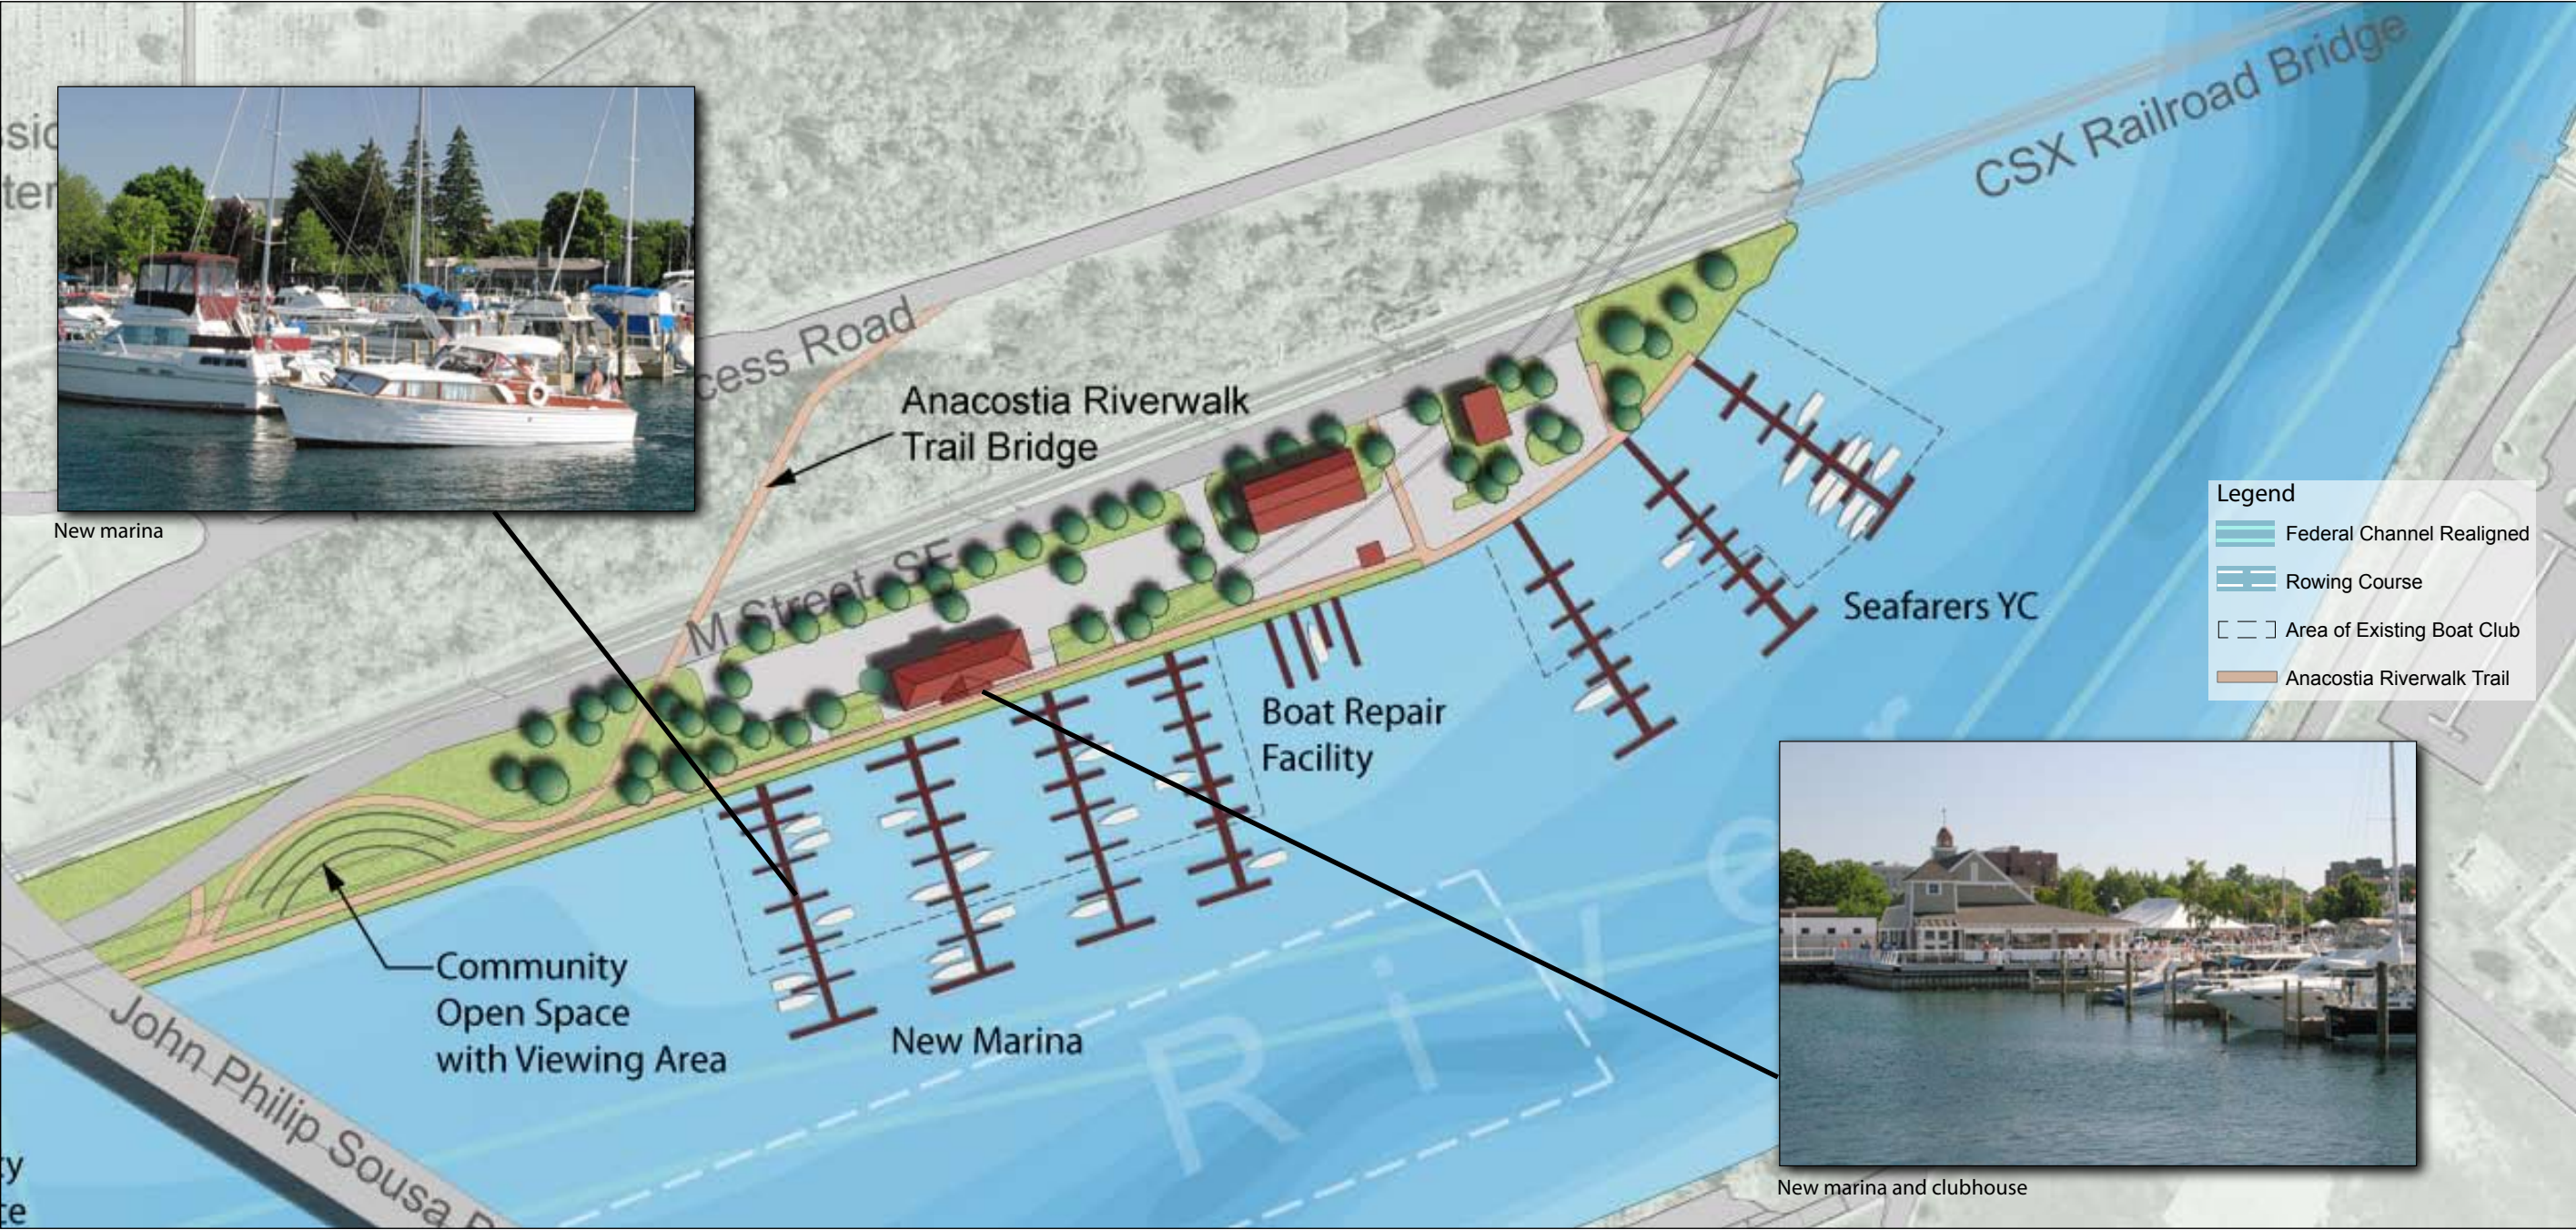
Enlarged plan of Concept 1 - East section
